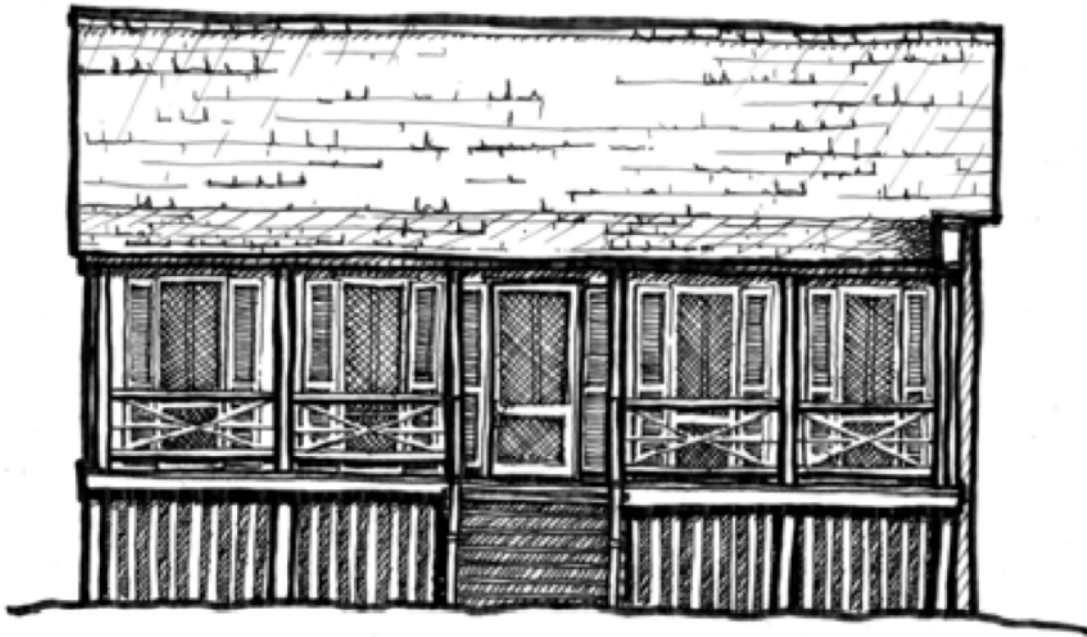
Front Porch Cottage Typology Elevation. Sketch by Amelia Millar.
